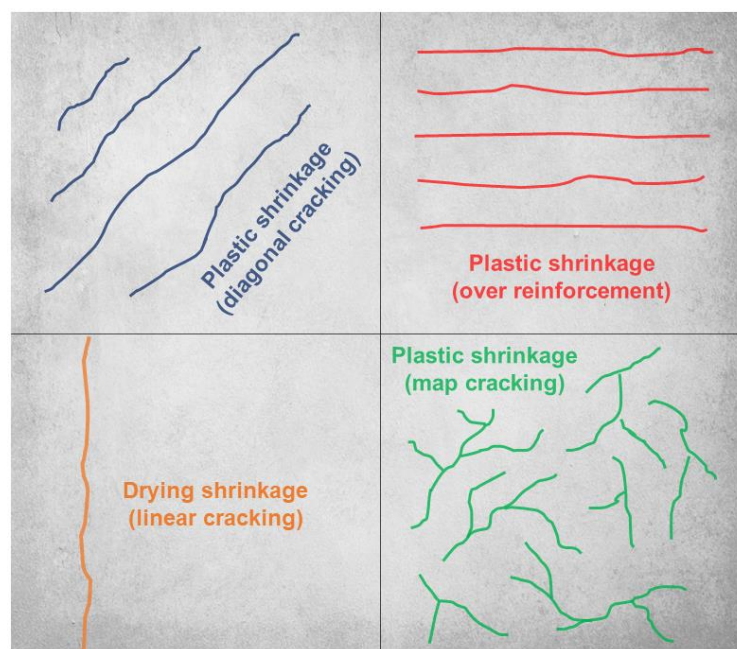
Typical plastic and drying shrinkage cracking patterns on slab panels (adapted from Day & Clarke, 2003:4).
